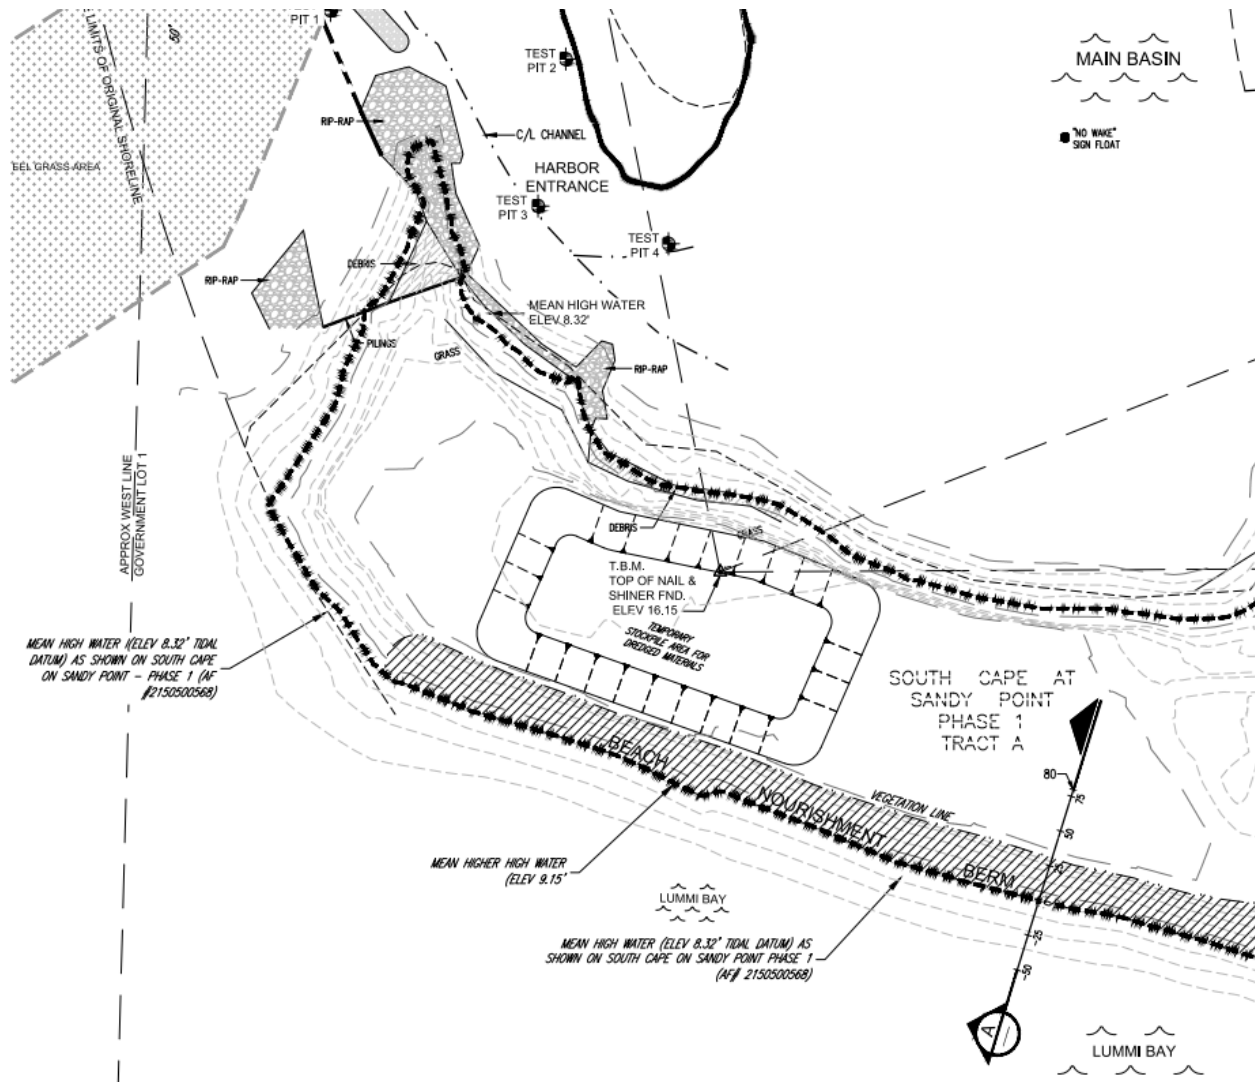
Location of proposed stockpile site and berm on the South Cape property.
